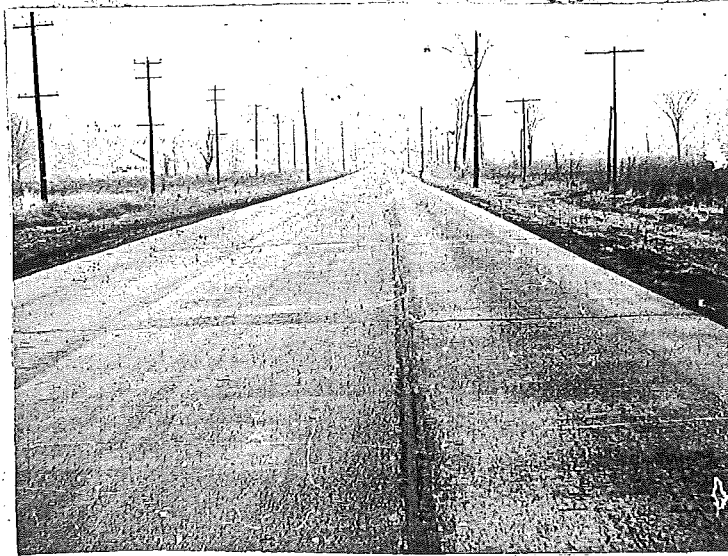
Project 77-4, C4, 1-26-44. General view of pavement showing excellent condition of both the recapped and widened surfaces in the limestone section.
